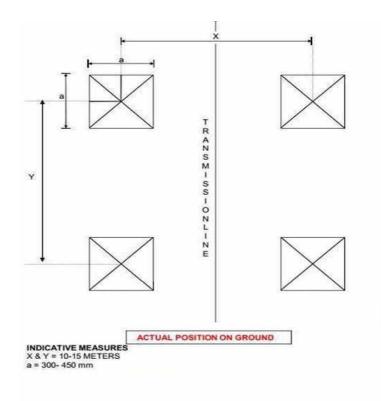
Typical Plan of Transmission Line Tower Footings Showing Actual Ground Position and Extent of Impact
